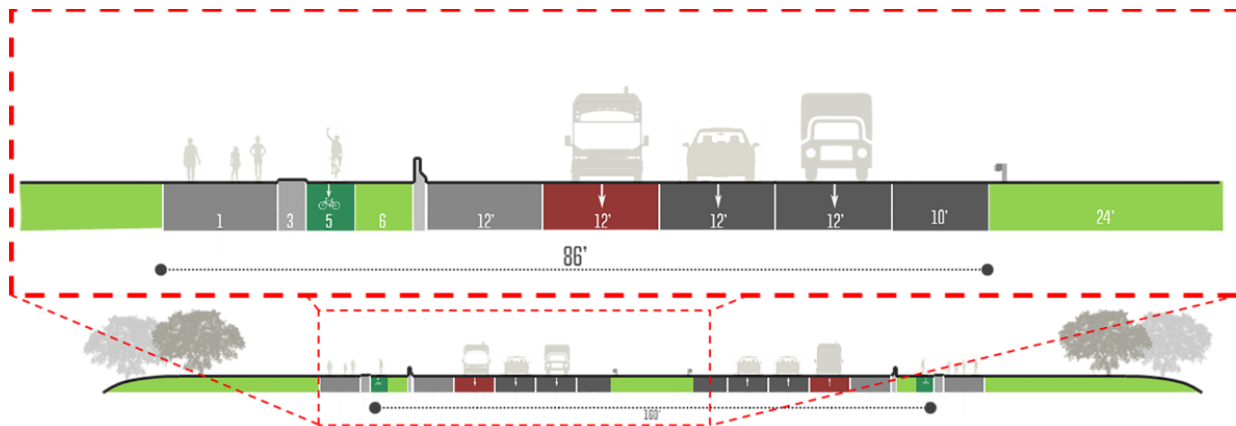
SR A1A/Collins Avenue/Indian Creek Drive Transit Corridor Potential Typical Section from 17th Street to 44th Street
